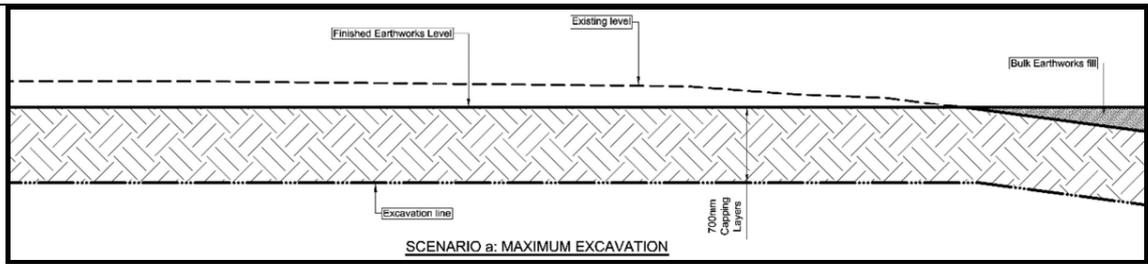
Maximum excavation scenario (source: Walters, 2020)
